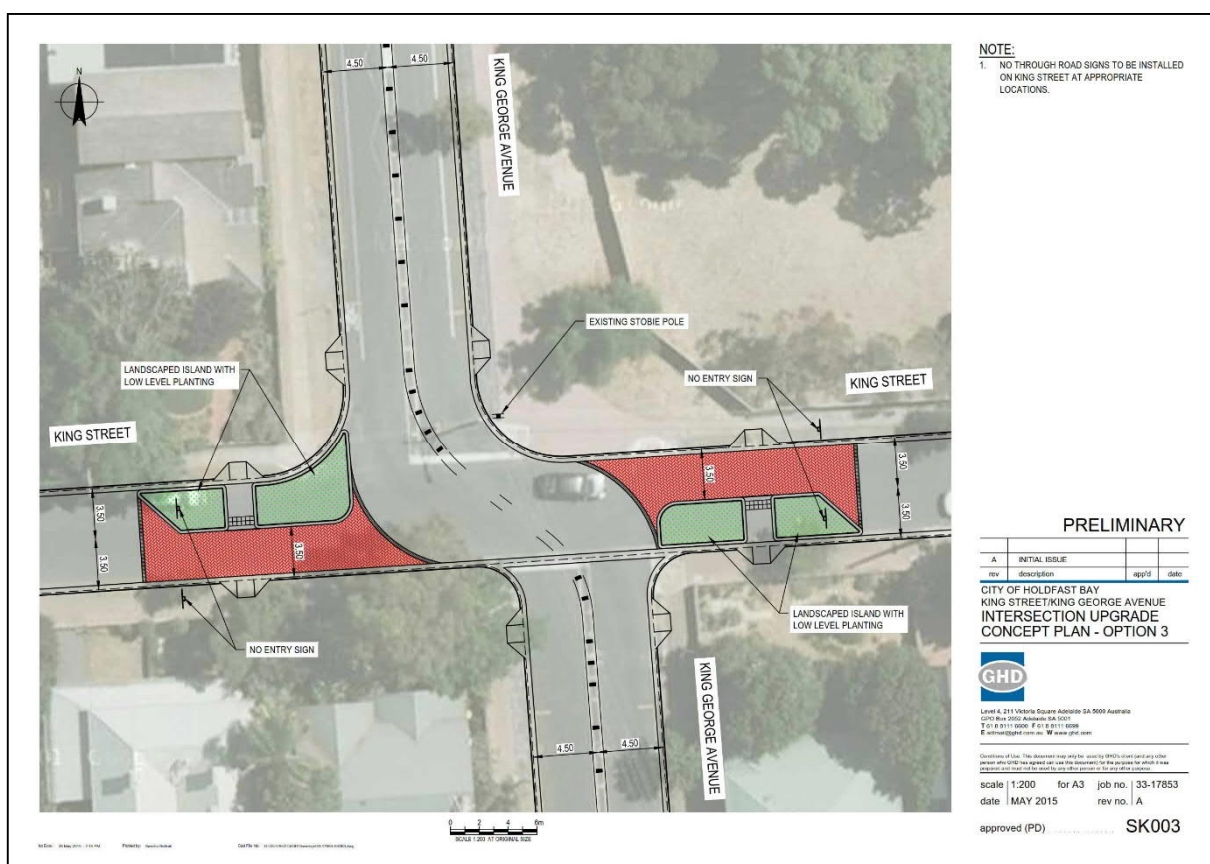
Intersection of King George Ave & King St – upgrade concept plan option 3
